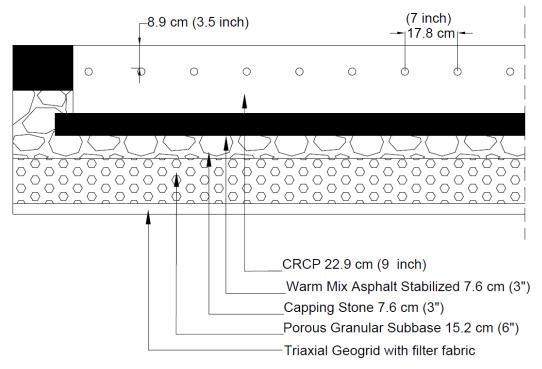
Cross section of sections 3A and 3B with 3-inch WMA base and various sub-base.
